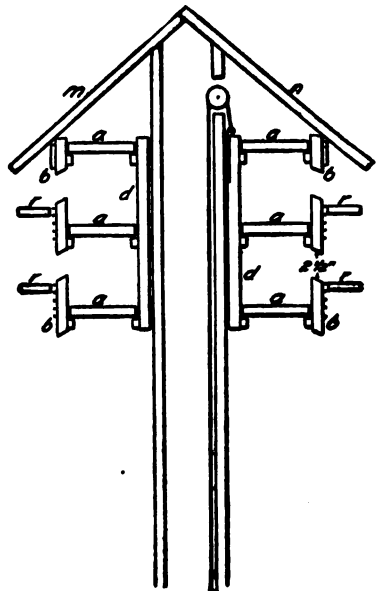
Cross vertical section of martin house; raised, and doors open.
